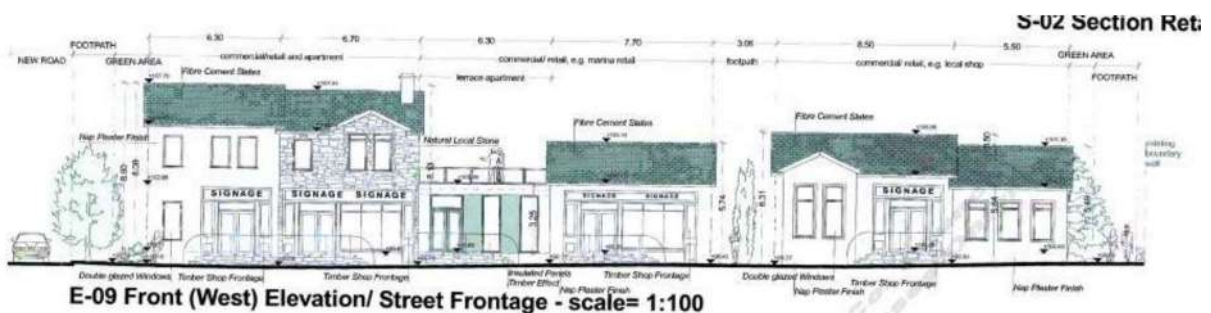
Previous (modified, unbuilt) application No. 0981 for adjacent site - sample elevation
